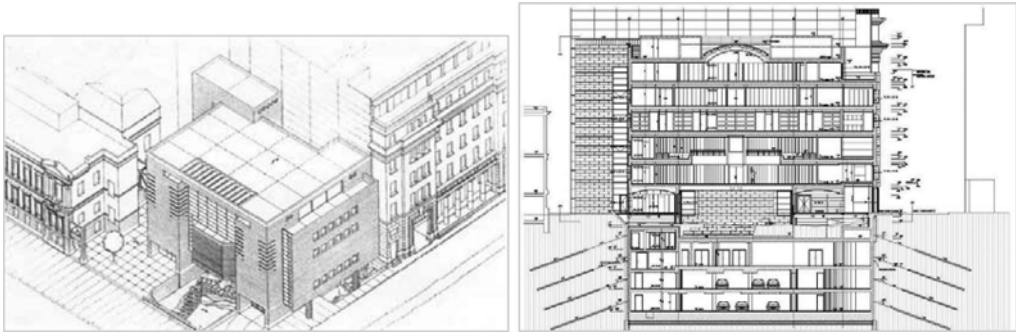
(a) Drawing of the NBG Administration Building with the antiquities preserved in the ground floor – basement. (b) Cross section with the underground floors below the antiquities.
